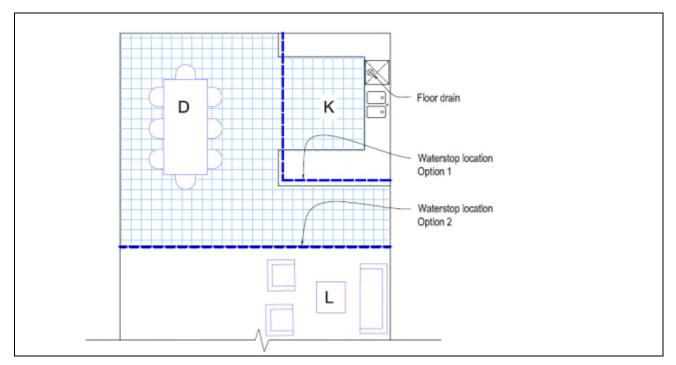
Extent of waterproof membrane system for an open-plan kitchen/dining/living room
